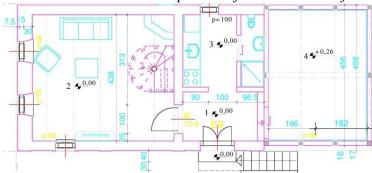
Reconstruction and adaptation of a tourist house for 4-8 people
